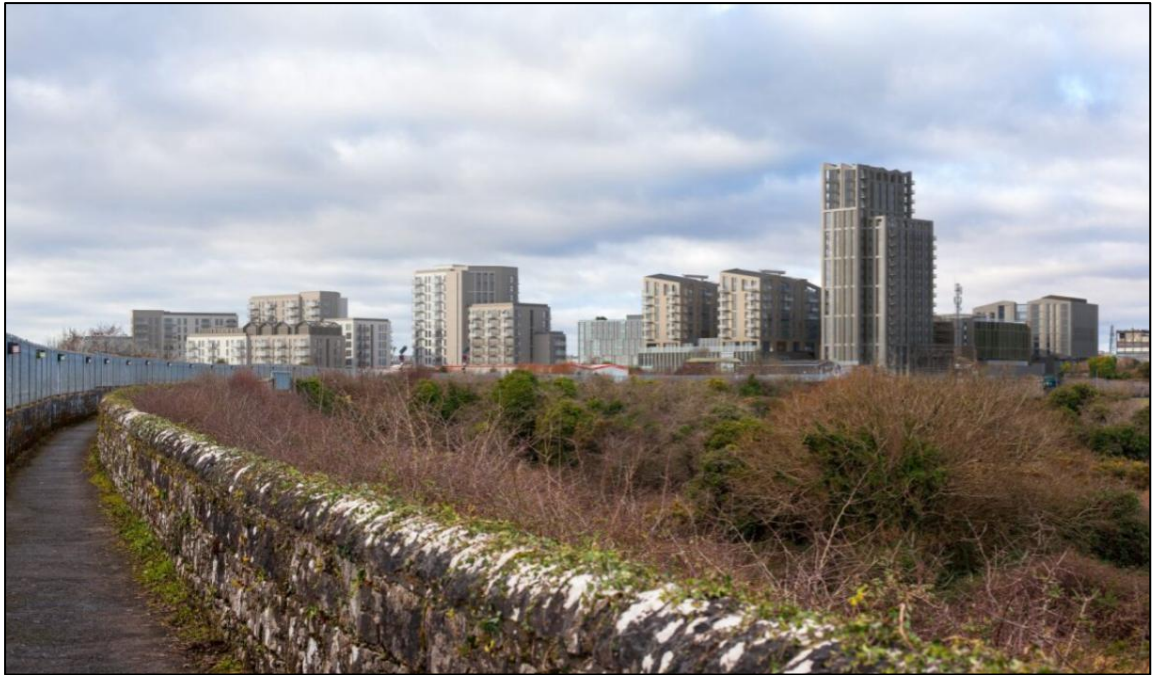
Verified View No. 3 (proposed) from across the railway bridge to the site's north-east
